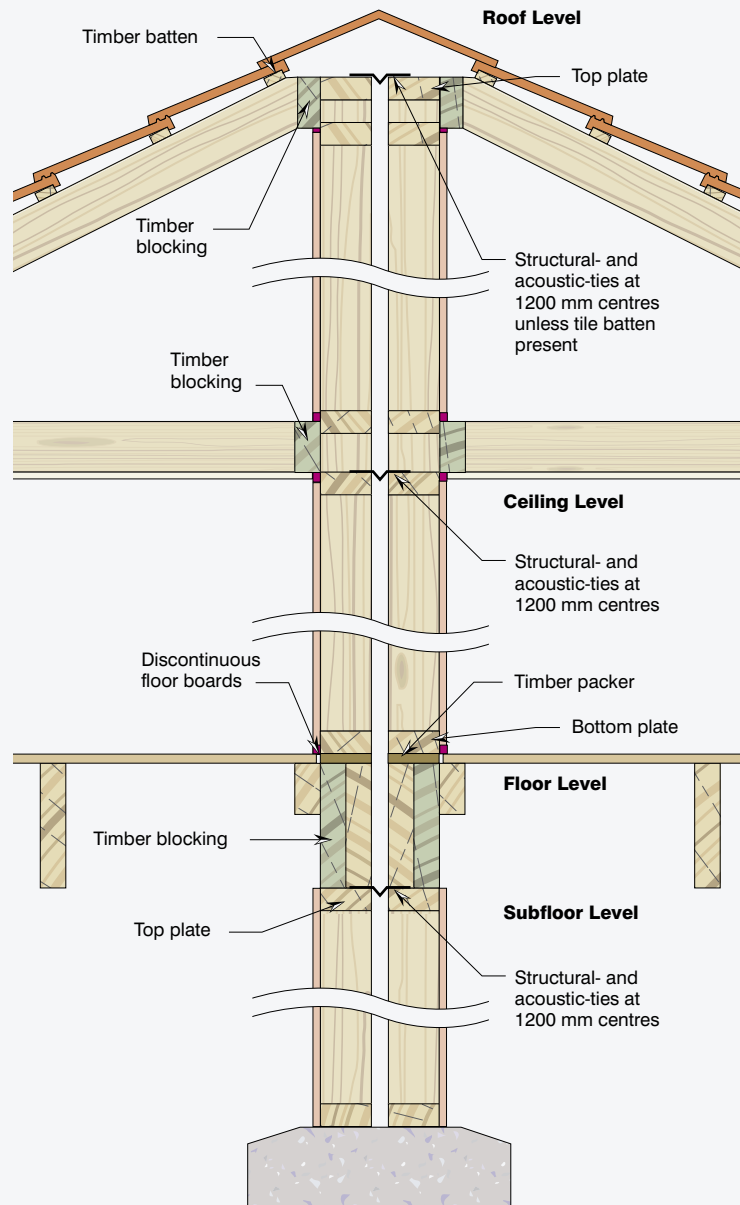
Structural and acoustic ties used to laterally support the separating wall – elevation view.
